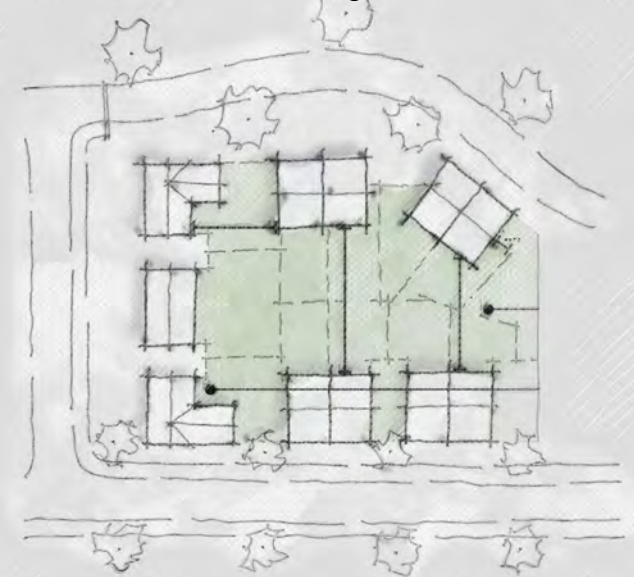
Creation of secure private gardens, enclosed behind buildings.
